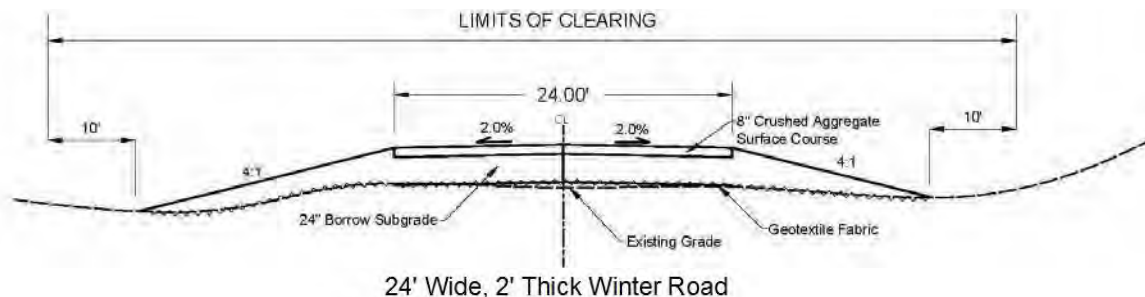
24-Foot Width Winter Road - 2-Foot Section
